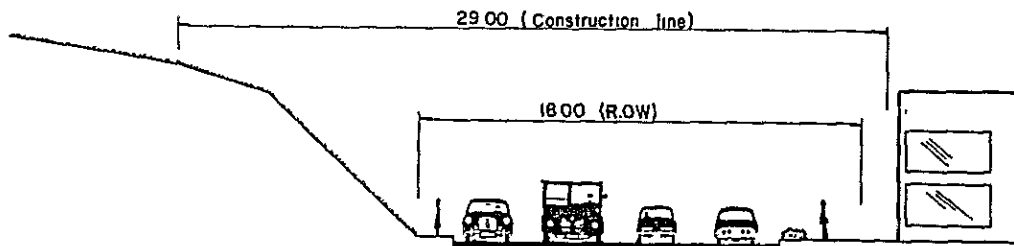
EXISTING CROSS SECTION OF VIA ESPANA(2)
